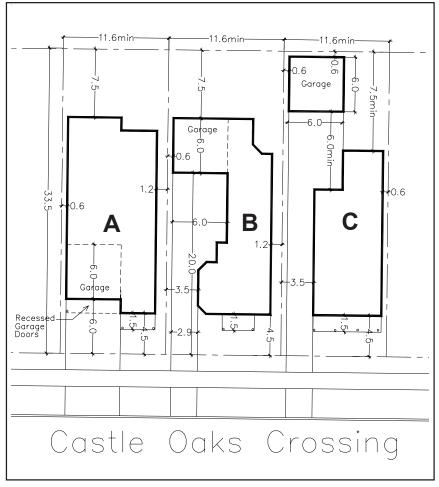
Conceptual Lot Typology on Castle Oaks Crossing
